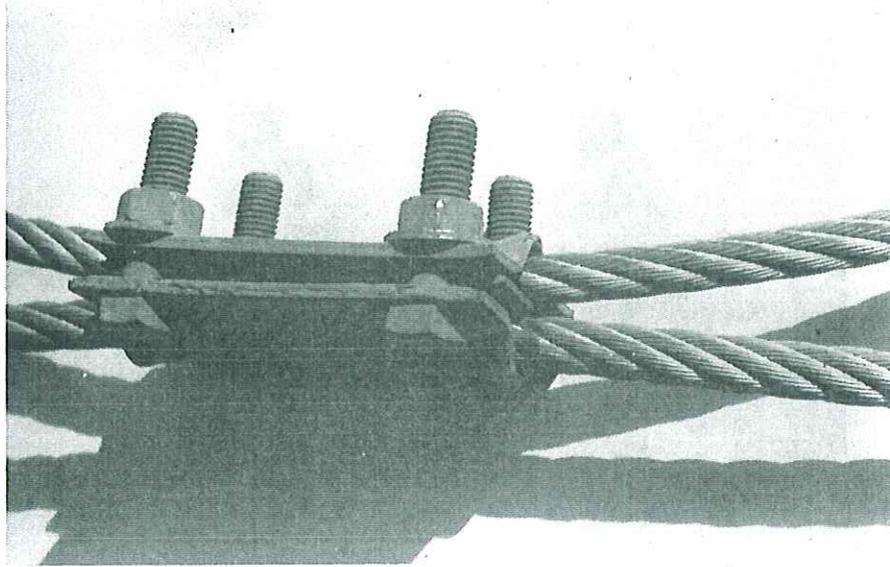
INDUSTRIAL ENTERPRISE FRICTION BRAKE. NOTE FLARED ENDS OF BRAKE PLATES
